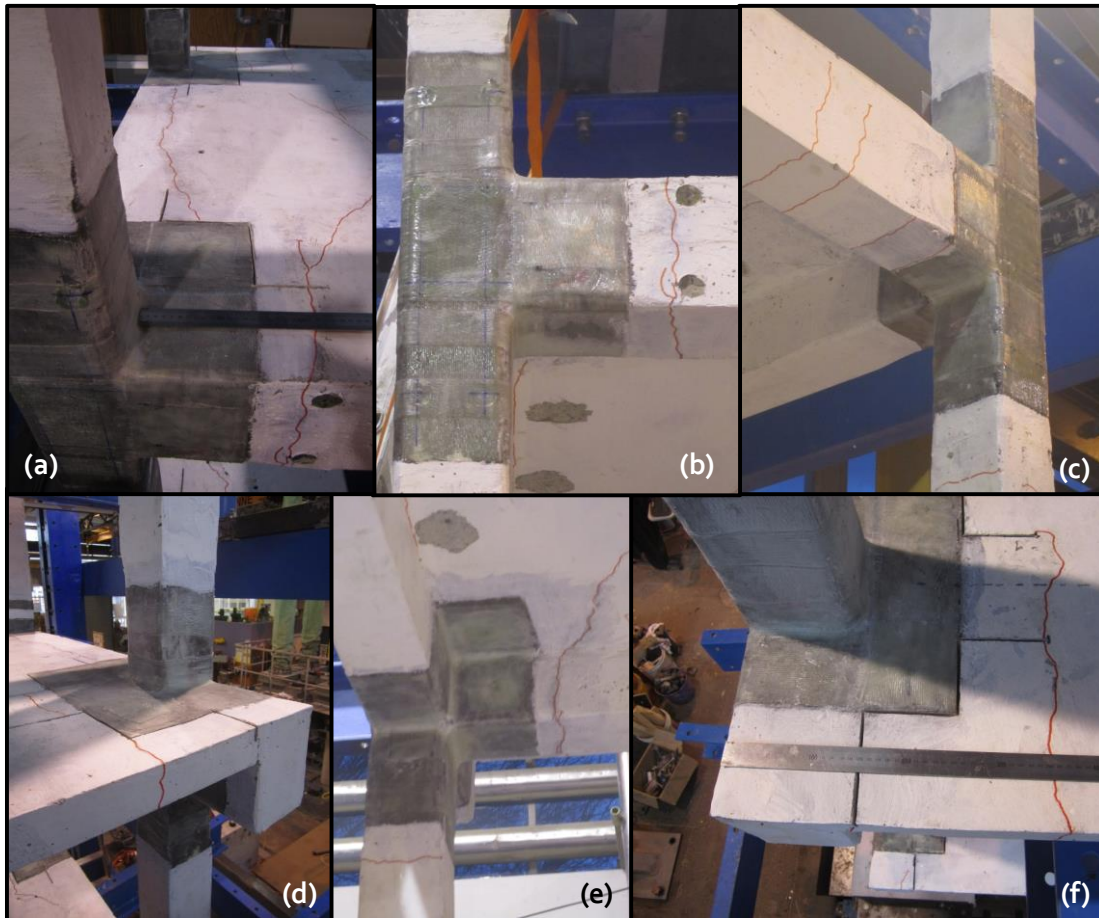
Observed damage in 2nd floor beam column joints; (a) long span top view, (b) long span corner, (c) short span corner, (d) long span cruciform top view (e) short span cruciform bottom view, and (f) short span cruciform top view.
